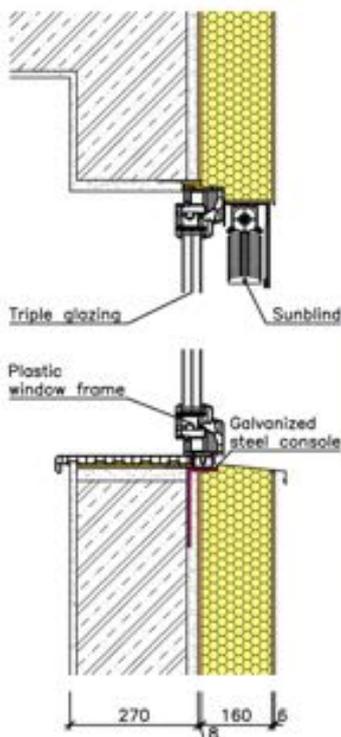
Cross section of the exterior wall and window. Window frame installed on galvanized steel consoles (red) protruding to new EPS thermal insulation layer (beige).
